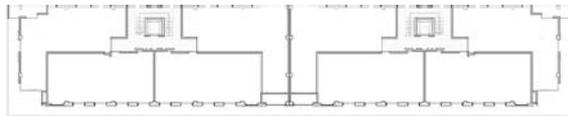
Cerdanyola residential building, alternative 3. Solar walls removed.
